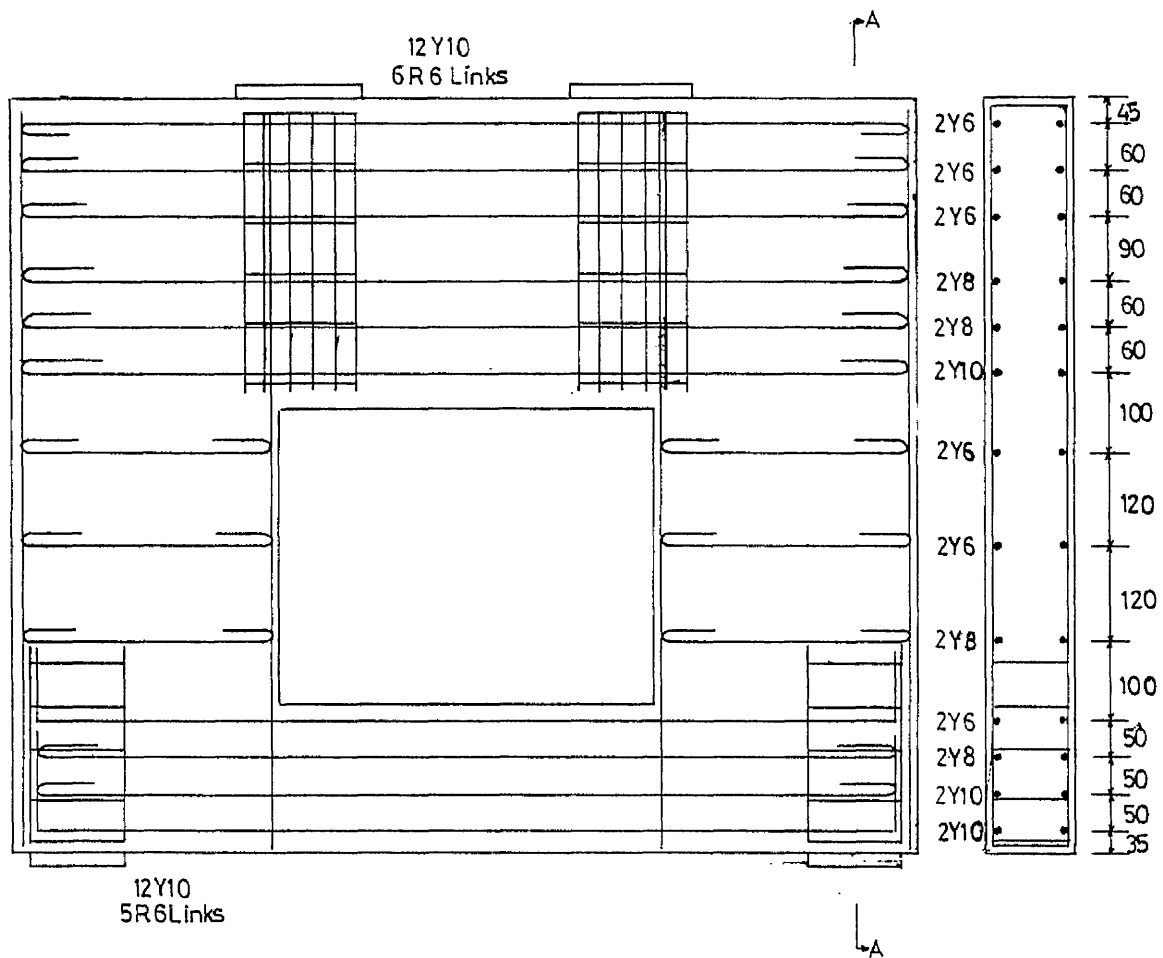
ARRANGEMENT OF REINFORCEMENT FOR BEAM B5. SECTION A-A.
